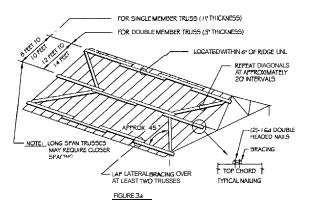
d 3. PROVIDETEMPORARYBRACING FOR TOP CHORD OF TRUSSES UNTILPLYWOOD SHEATHING CAN BE INSTALLED.
